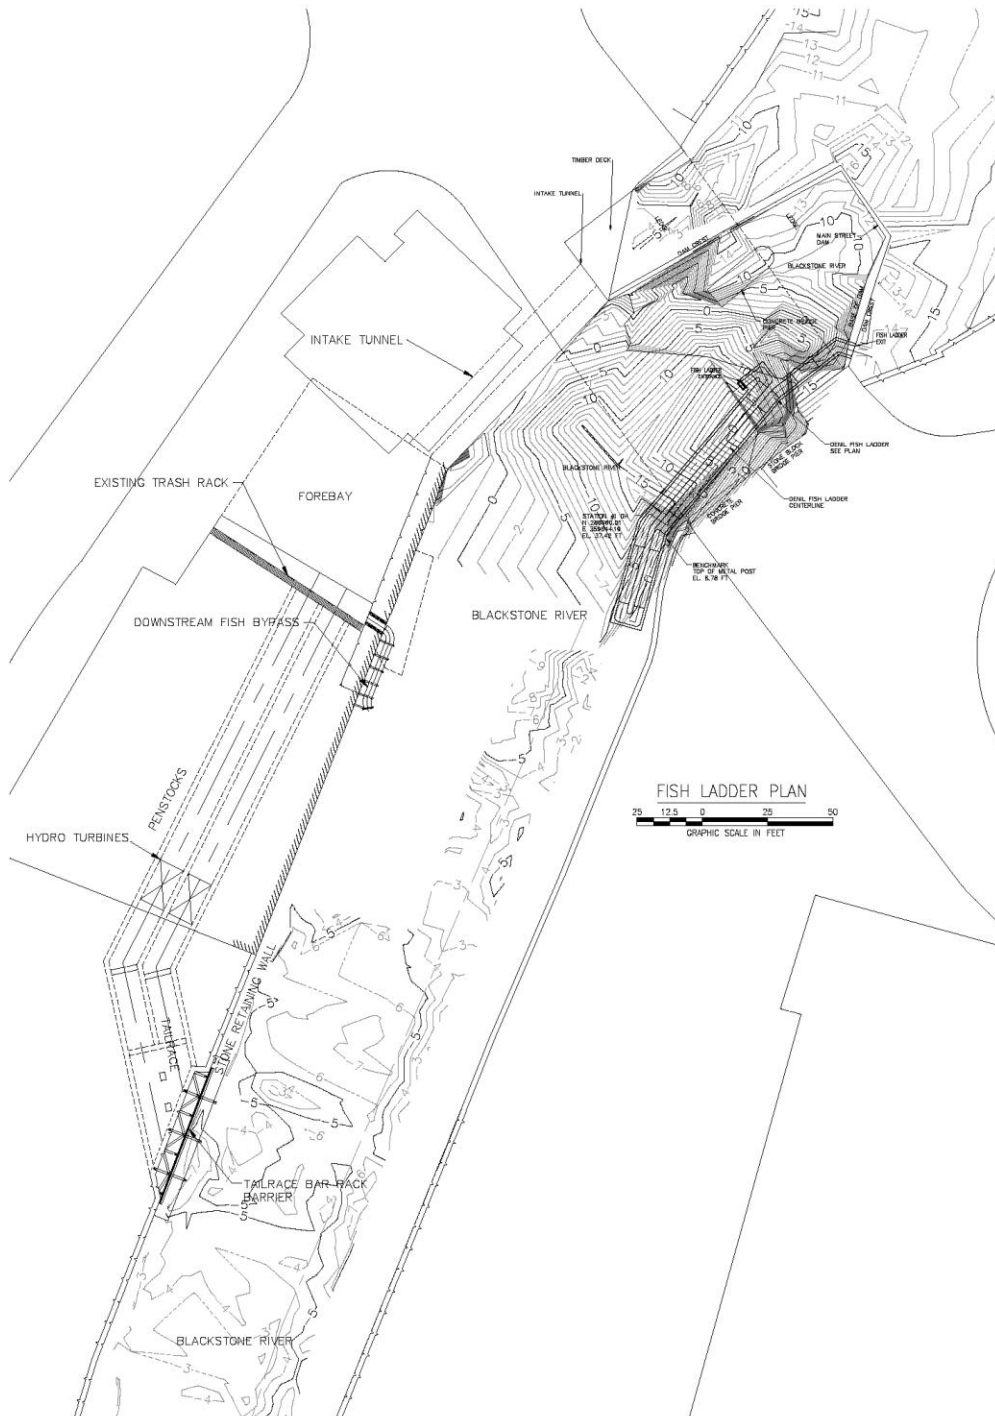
General Arrangement of Pawtucket No. 2 Hydroelectric Project
